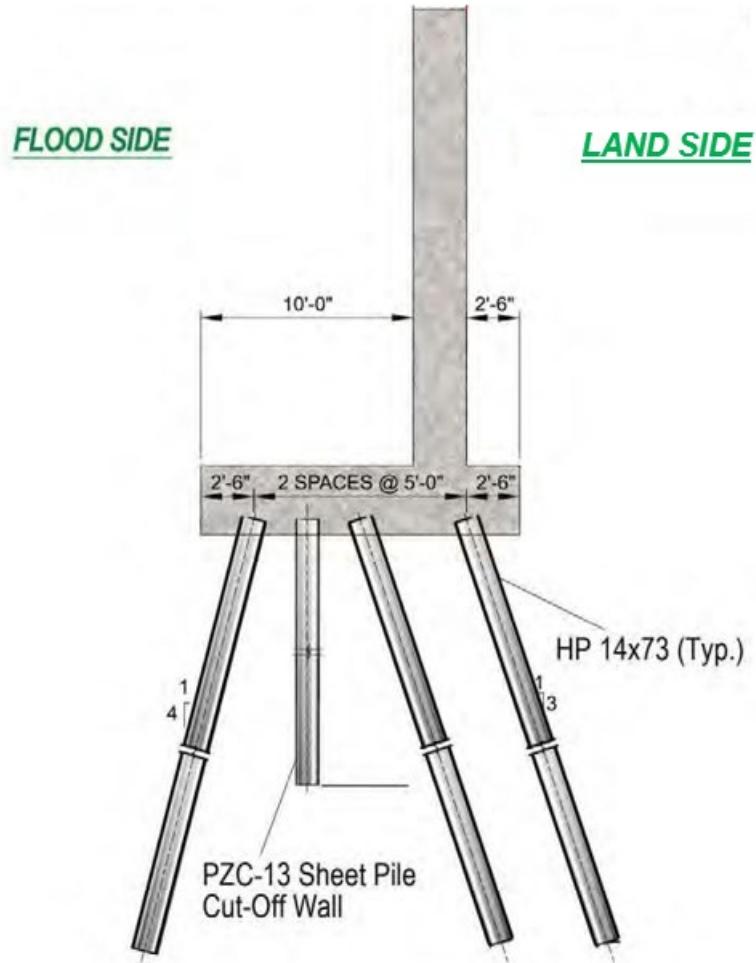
Typical Section of Fronting Protection Wall @ Pump
